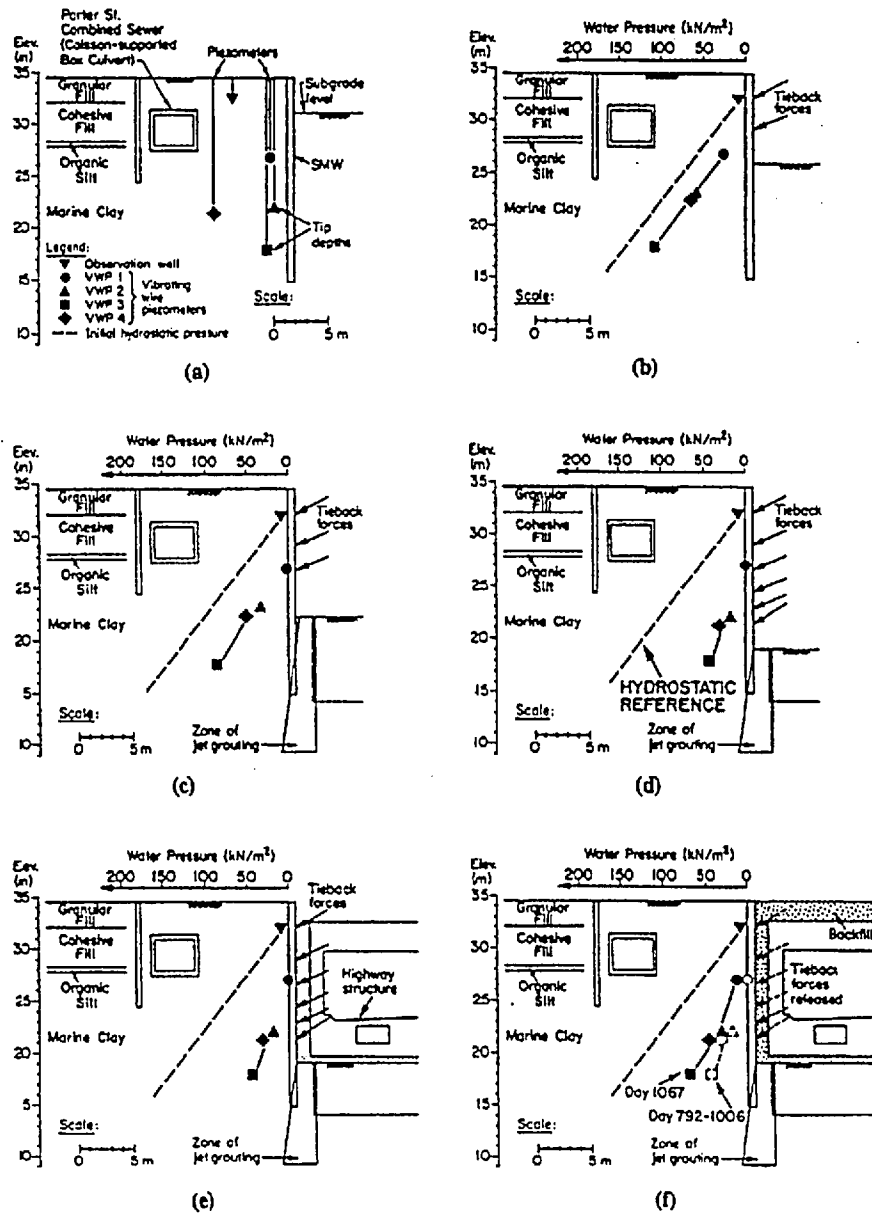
Piezometer and Observation Well Measurements Adjacent to Excavation: (a) Piezometers; (b) Stage 2; (c) Stage 4; (d) Stage 5 (Day 792); (e) Day 1,068; (f) Day 1,067
